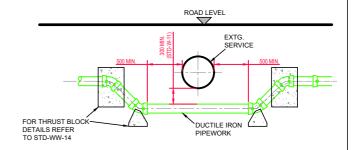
(RISING MAIN CROSSING OVER EXISTING SERVICES
